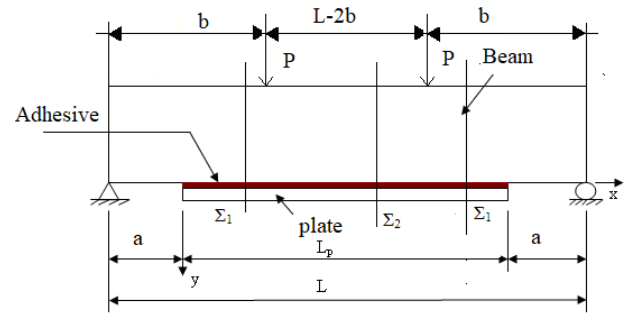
Simply supported beam bonded with a soffit plate under a point load a two point loads
